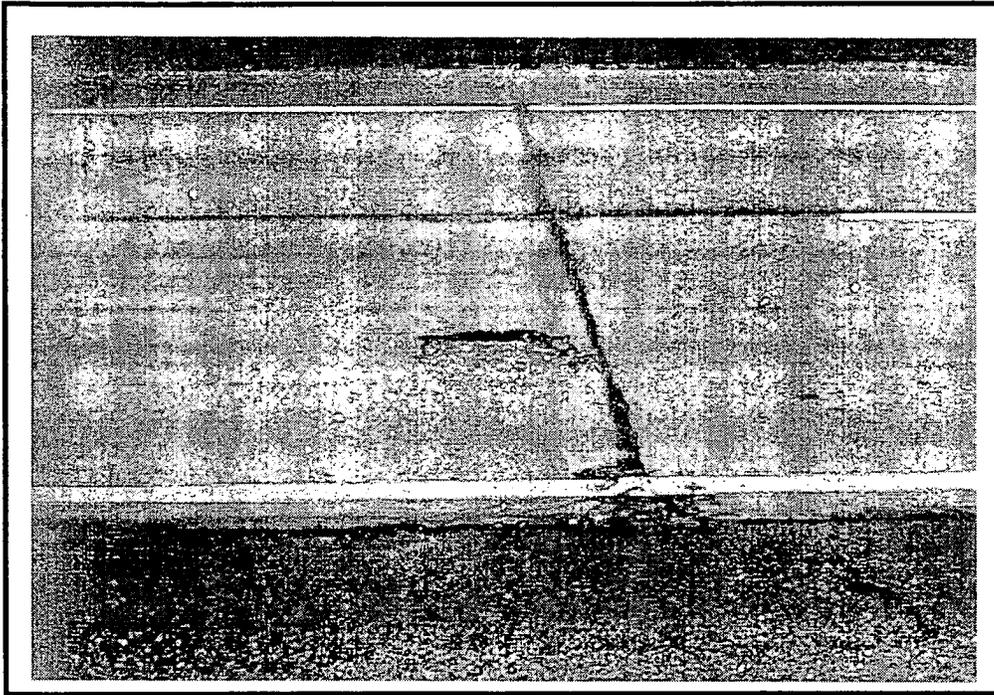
Pressure Damage in Jointed Concrete Pavement
